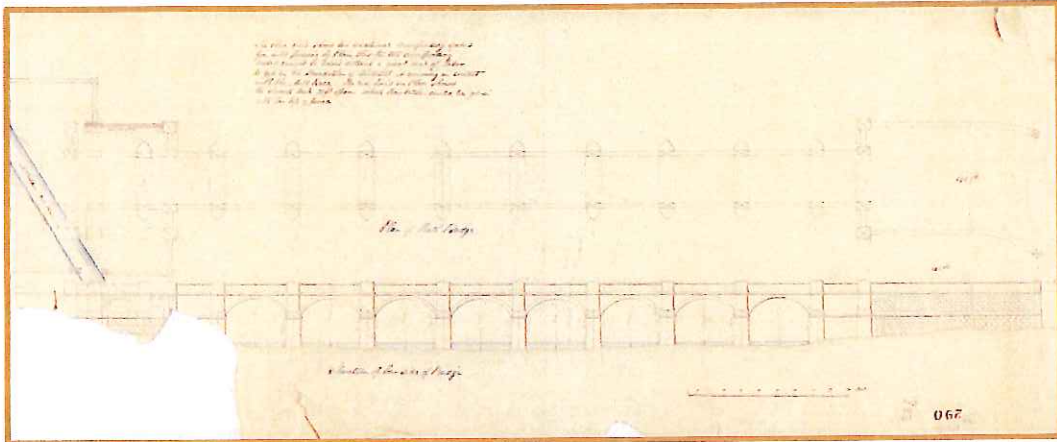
Plan of the earliest Perth Bridge. Source: Newitt 1988.
